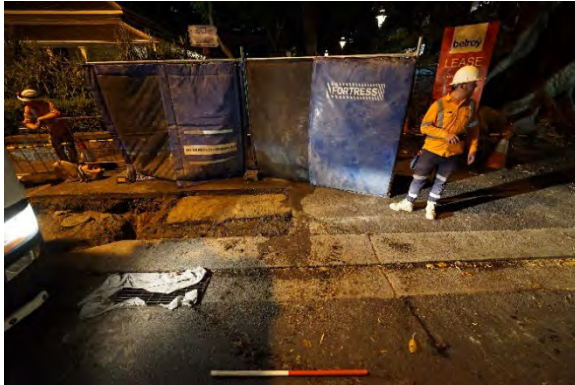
View south showing the removal of asphalt and exposed fills and concrete slab.
